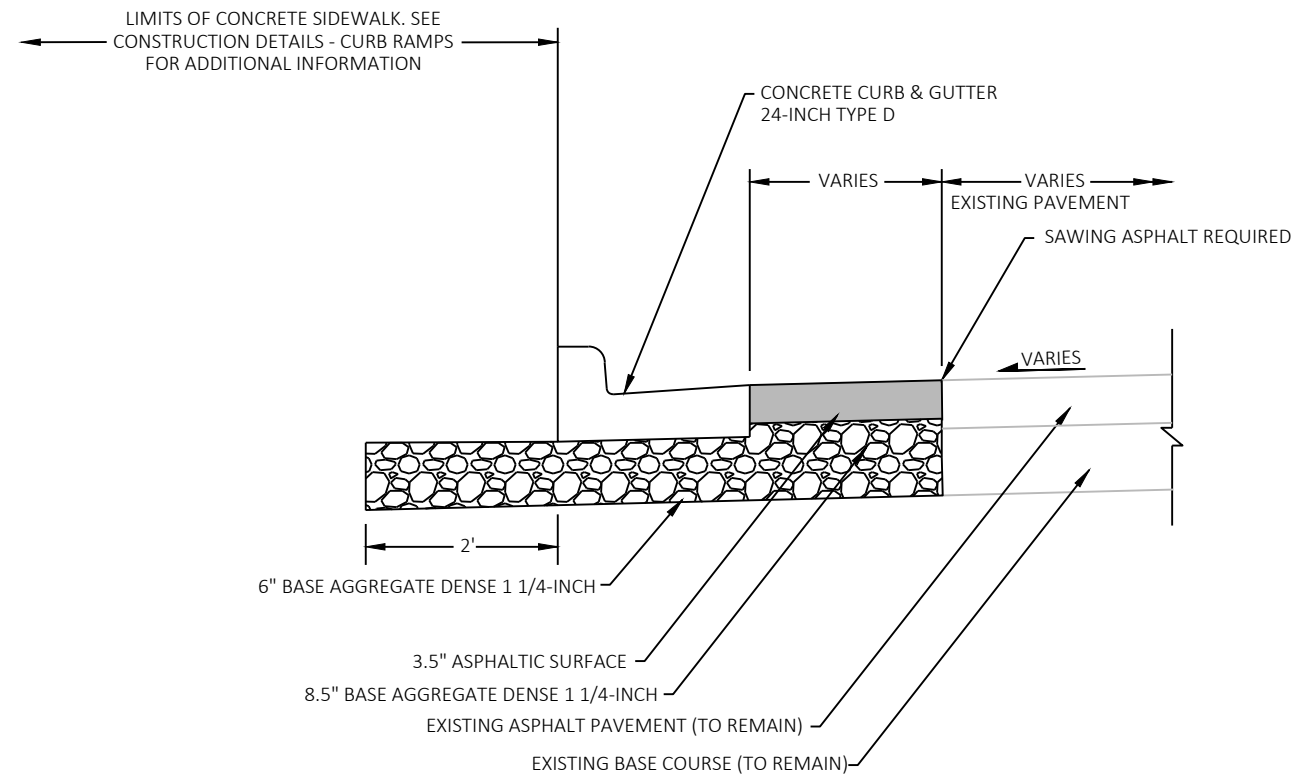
DETAIL OF REMOVING ASPHALTIC SURFACE MILLING AND HMA PAVEMENT AT INTERSECTIONS AND DRIVEWAYS
